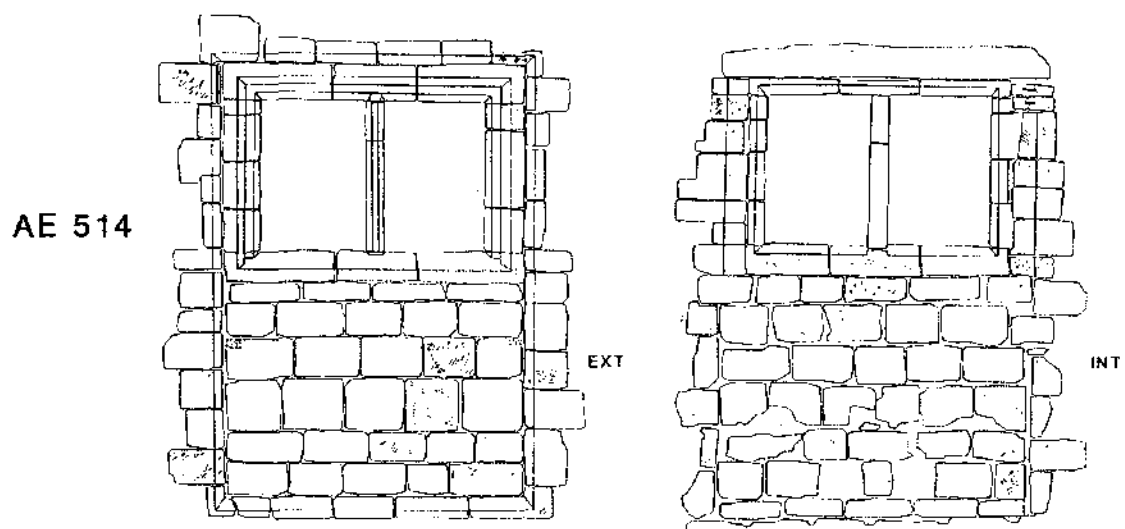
Structure 1, detail of window AE 514 in east wall.
